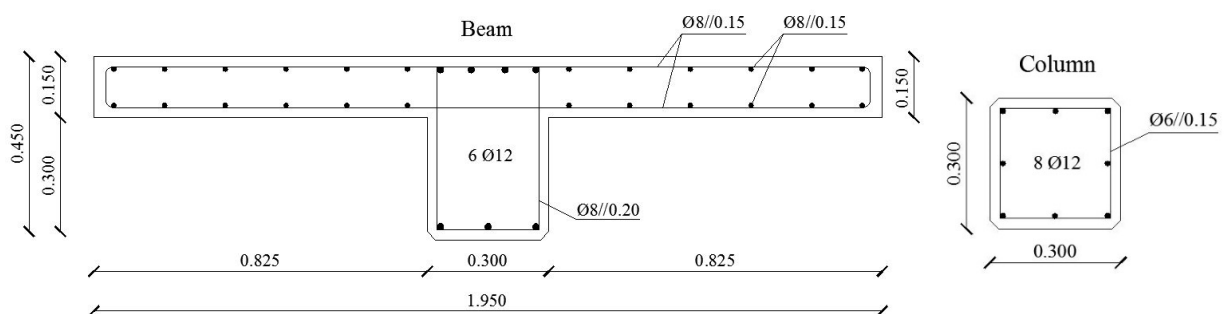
Reinforcement detailing for Beam and Column of Interior Joint (dimensions in meters)
